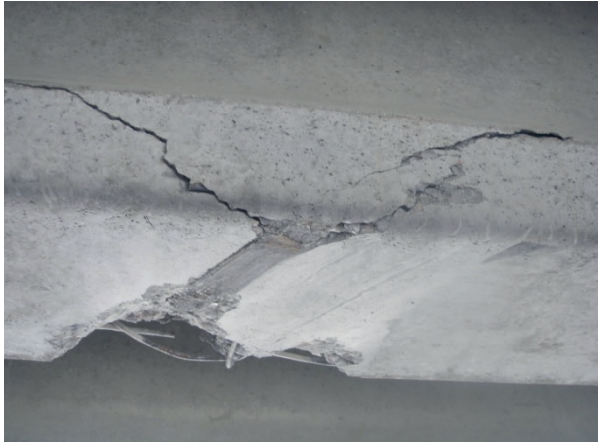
Destruction of the widened lower part of the beam No. 4 from the side of Almaty (The reinforcement of the smooth and periodic profile is torn. A longitudinal crack was revealed in the upper part of the beam rib of a length of about 3.3 m)
